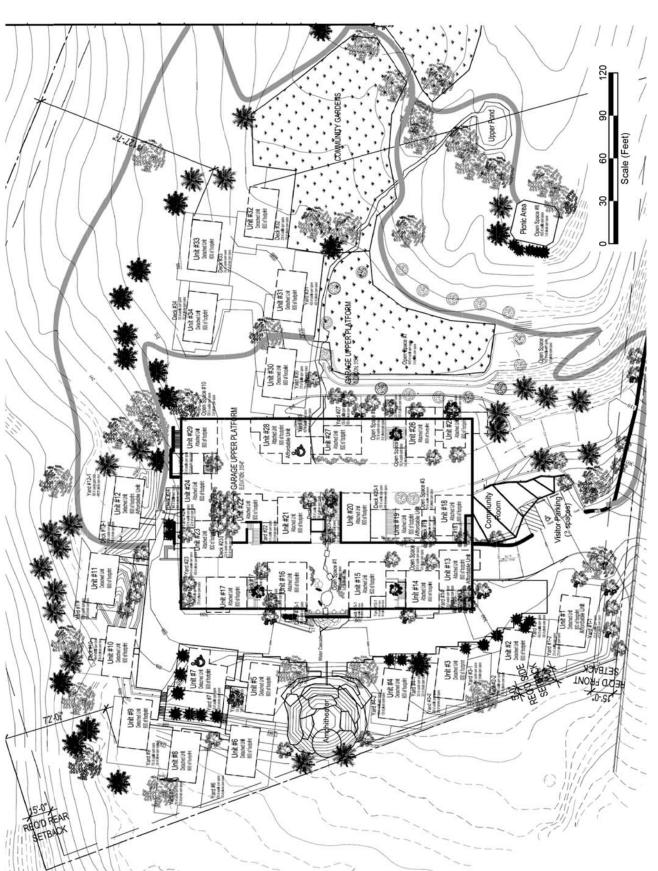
2004 34-Unit Project Site Plan and Landscaping Plan
